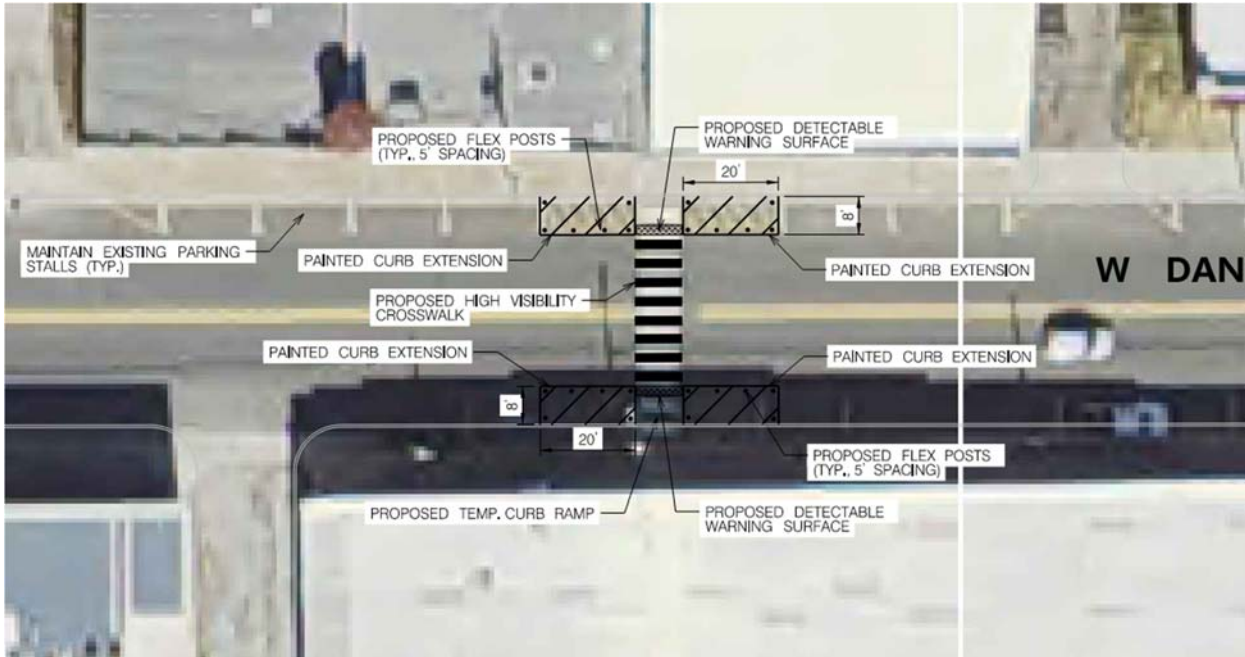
Mid Block Crossing at W. Danville Street - Conceptual Design - Short Term
